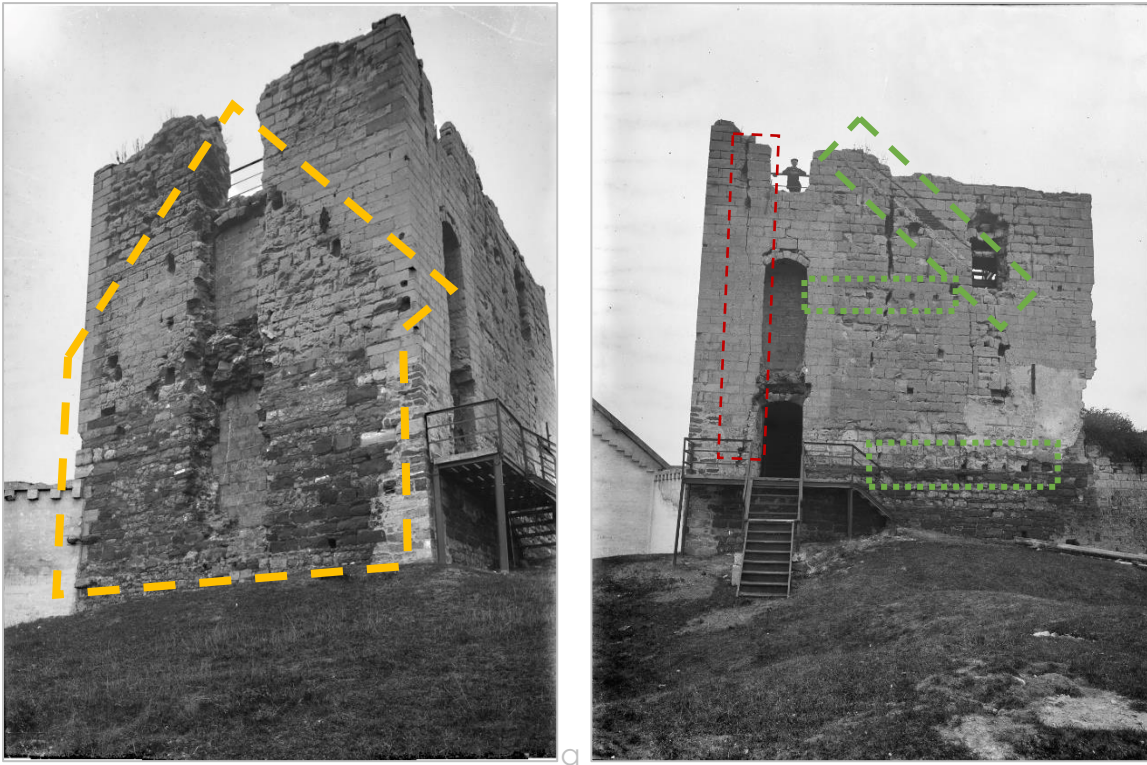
East (a) and north (b) side of the building. It clearly shows markings of former roof lines and cavities where beams were used to be. These walls therefore also served as separation wall between two buildings and openings served as passages to different parts of the castle. Source says these pictures are taken in 1893, which cannot be as the inner staircase was firstly constructed in 1904 (Sprenger, 1941). Probably these pictures are therefore dated soon after the staircase was constructed. Adapted from a) (Anonymous, ruïne Ligtenberg, 1893a); b) (Anonymous, ruïne Ligtenberg, 1893b).
